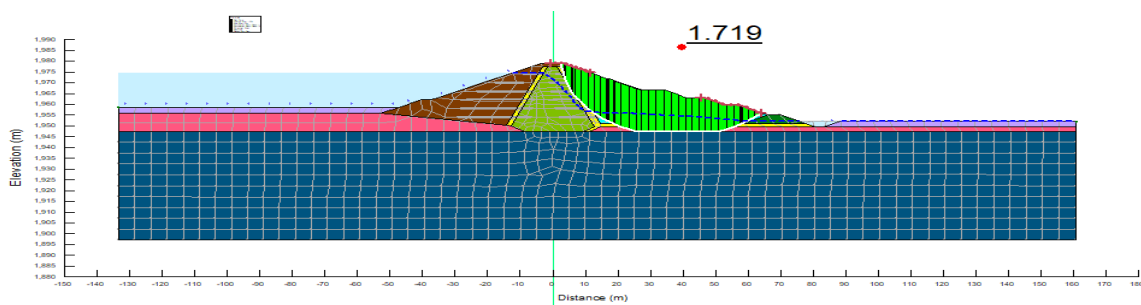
1V: 1.9H downstream slope reinforced dam finite element calculated static stability ((steady state case)
